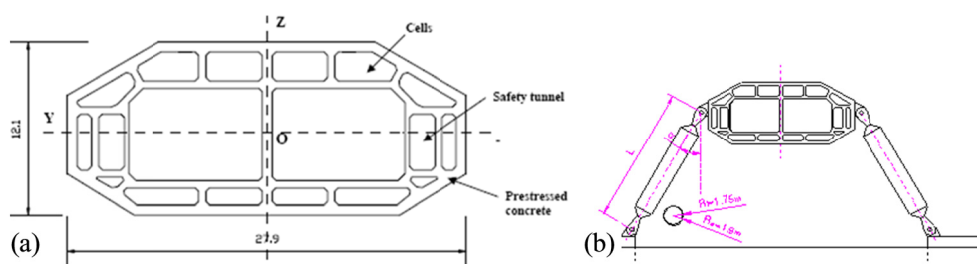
The AB for the Jintang strait crossing: (a) pre-stressed reinforced concrete cross-section; (b) anchoring systems
